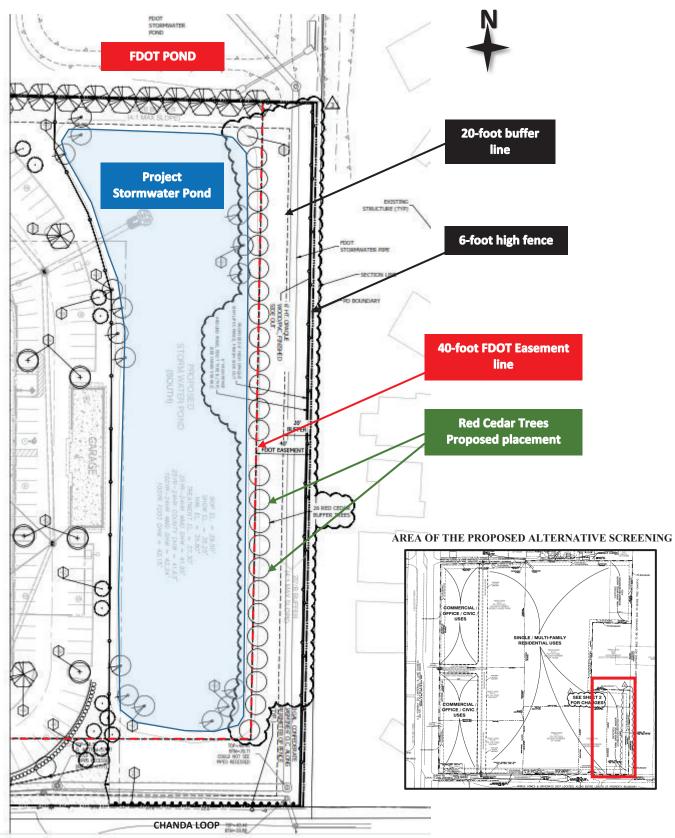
Sheet 2 of 2 PD Plan – Proposed Plantings and Location
